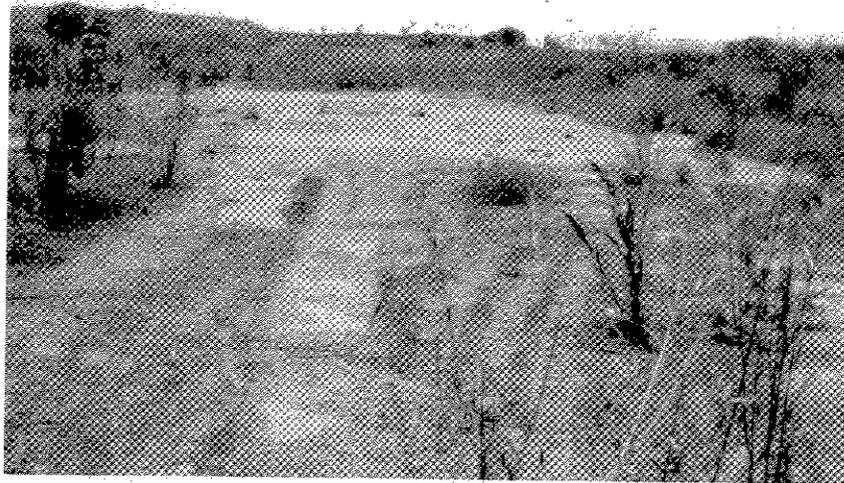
EW009 After Cysts-Bearing Soil Removal
